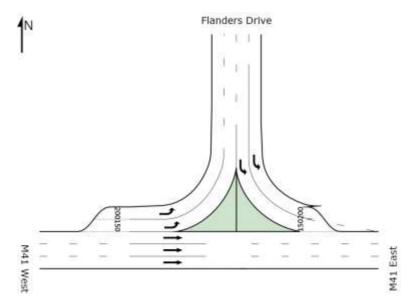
Future layout of the Flanders Drive/ M41 Intersection
